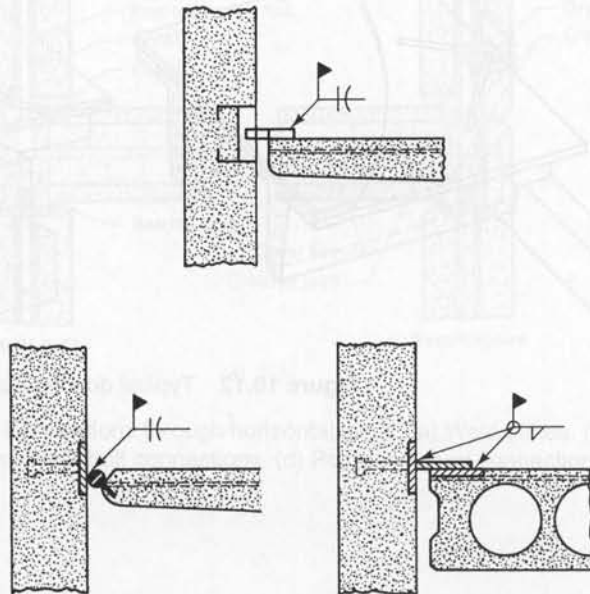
Construction method and typical joint details in Gulf Life Prestressed Building, Jacksonville, Florida.
